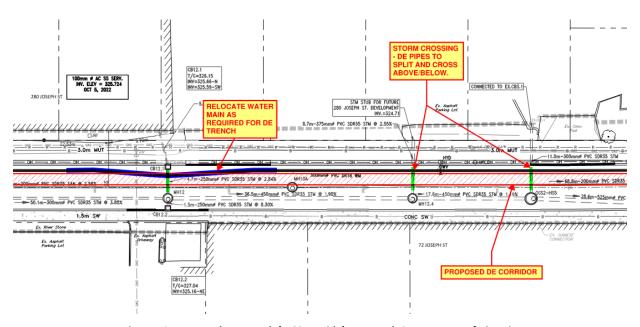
Proposed DE Trench (1.60m Wide) on Joseph Street, West of Victoria
